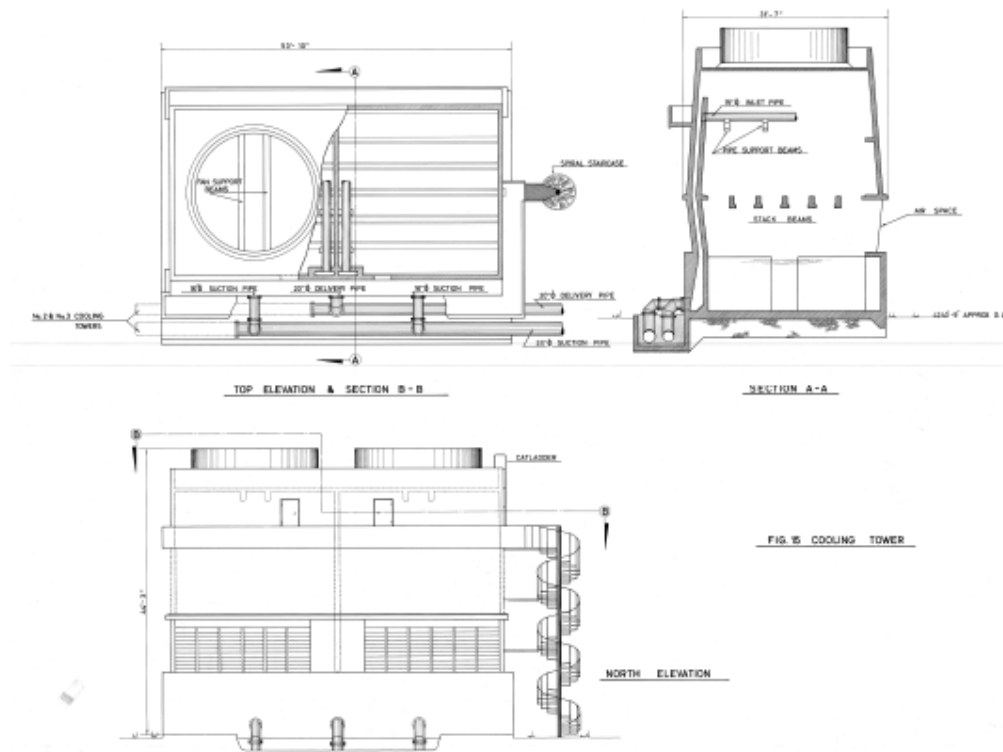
No 2 & No 3 Cooling Towers Elevation and their section [3]
